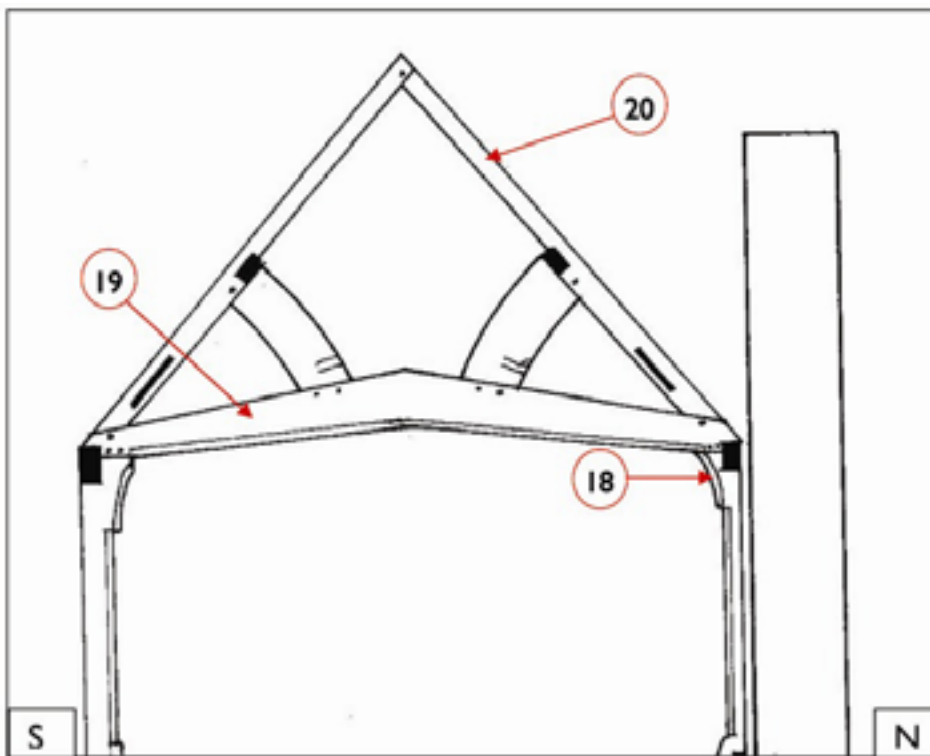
South cross-wing truss 2 showing sample locations, viewed from the east looking west (based on a drawing provided by N Hill)
